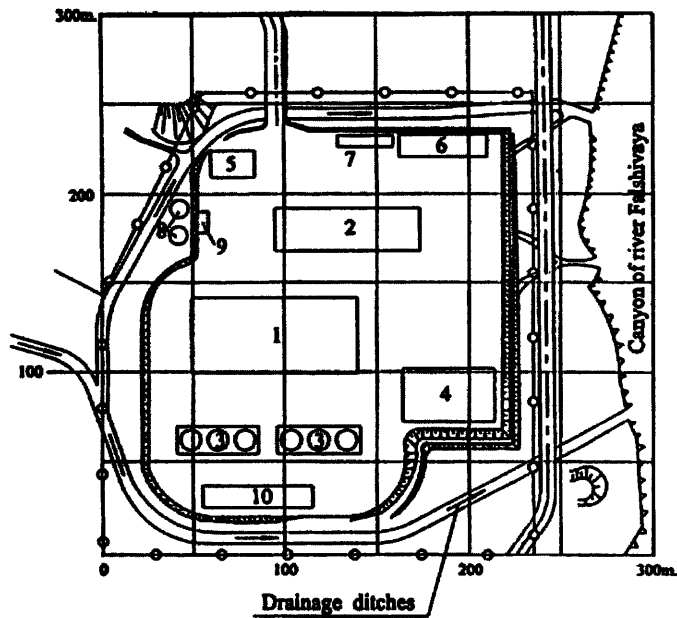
Layout of buildings Mutnovsky Single Flash Power Plant: (1) Power house; (2) Indoor Switchgear; (3) Mechanical draught cooling towers; (4) Emergency holding pond for separated brine; (5) Working Hostel; (6) Garage, Workshops, Storage; (7) Open parking place; (8) Firefighting water storage tanks; (9) Water supply pumping station; (10) Water treatment facility: storm water; sewage water.
